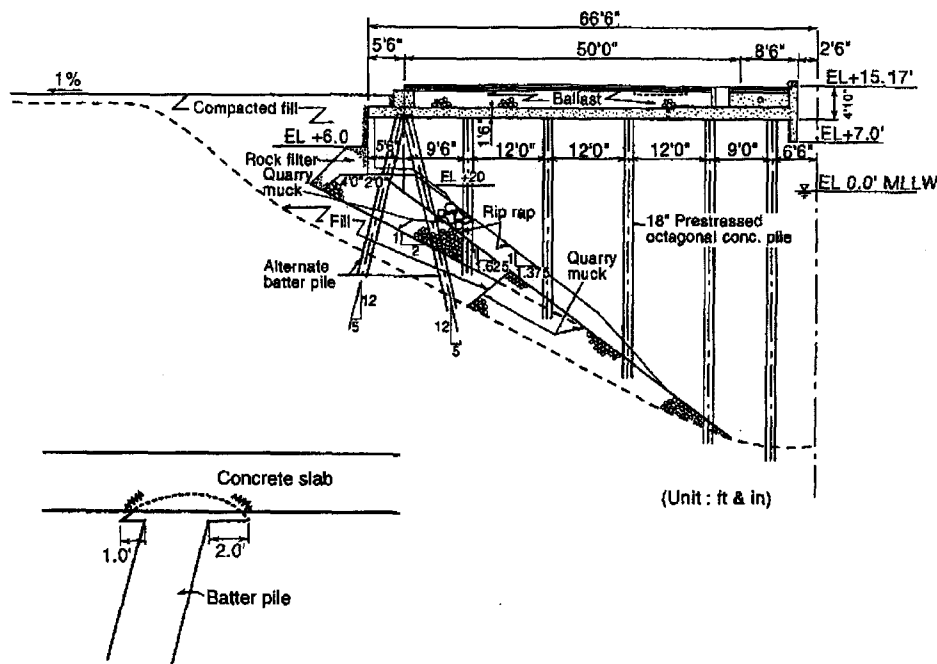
Layout of APL terminal B127 and schematic of damage due to pullout- or chipping of concrete off batter pile caps (Iai, in press)
